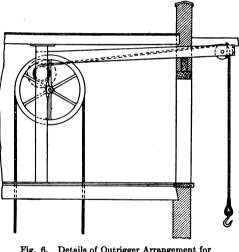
Details of Outrigger Arrangement for Sling Hand Elevator
